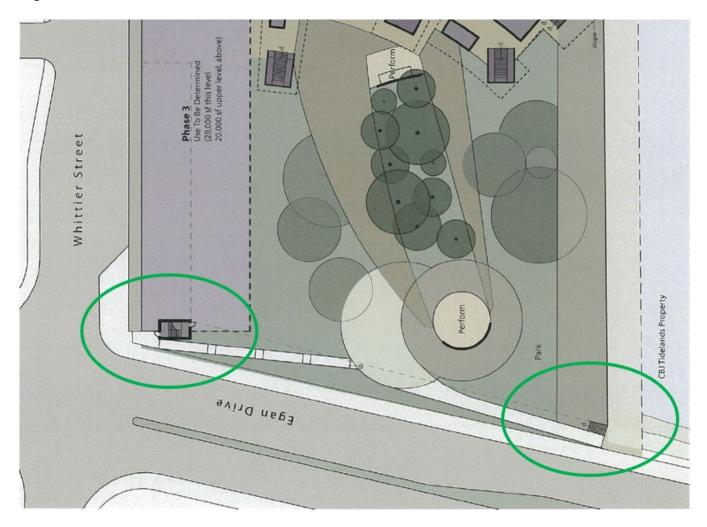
In the absence of a CBJ seawalk connection, pedestrians can access the Egan Drive sidewalk via the park. The park will be designed to provide sidewalk access at the east and west ends of the park, with an earthen berm dissuading pedestrian access along the length of the lot line.
